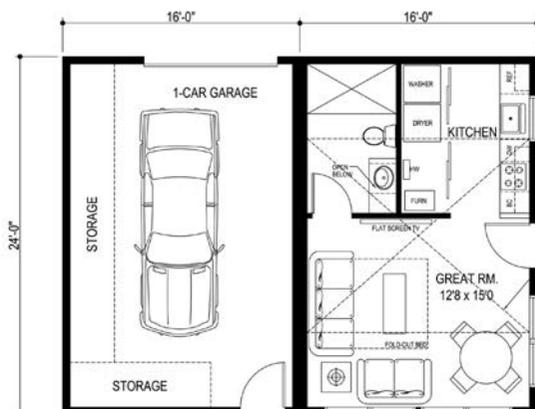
Secondary suites floor plan. Sidekick Homes 2011
